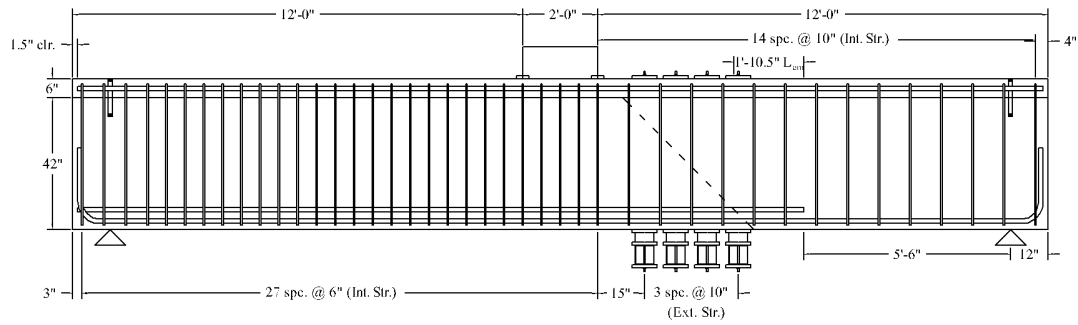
Elevation of specimens T.45.Ld3.(4) and T.45.Ld3.(5)
